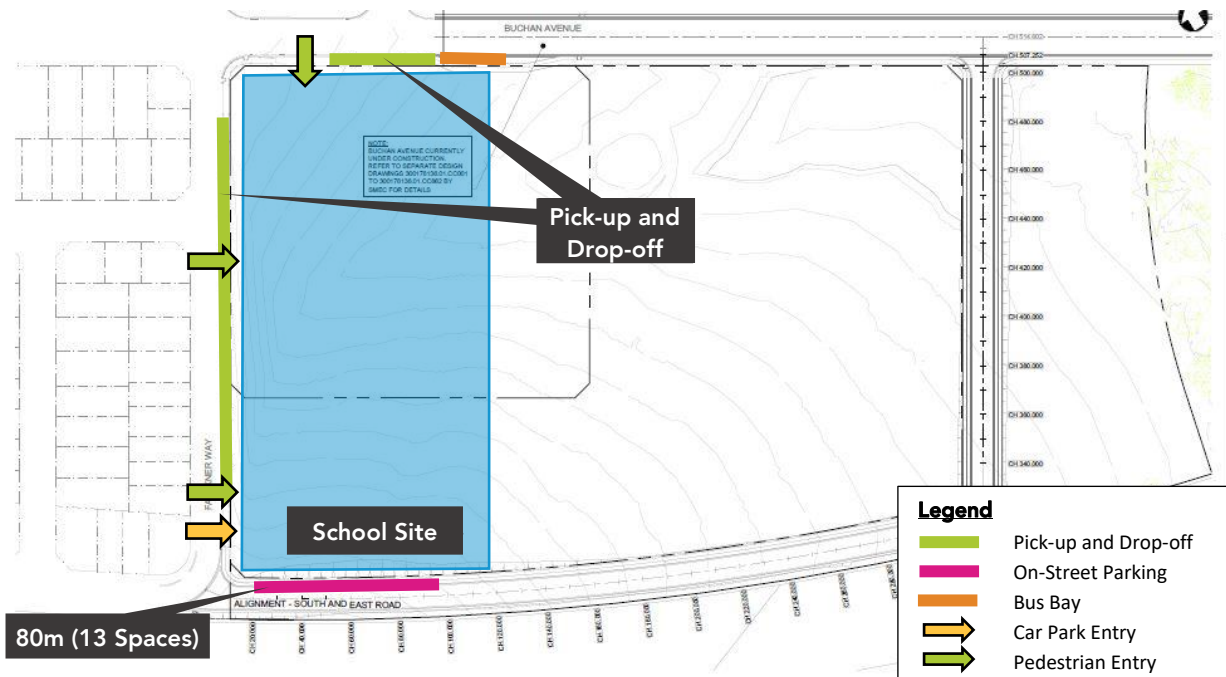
On-Street Parking Spaces on the vicinity of the Site
